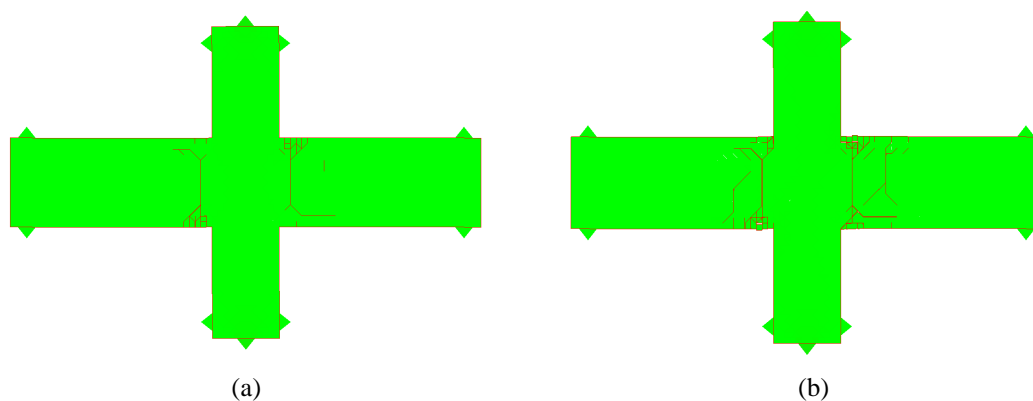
Failure patterns for interior beam-column joint without stirrups:
